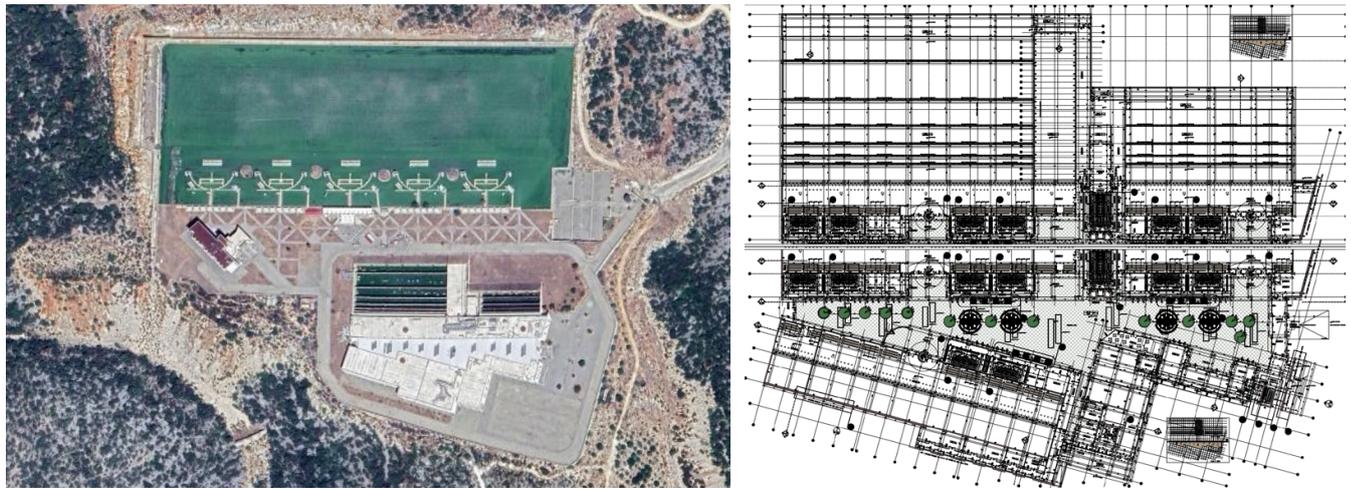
Aerial view and ground floor plan of the Mersin Erdemli Shooting Range complex.
